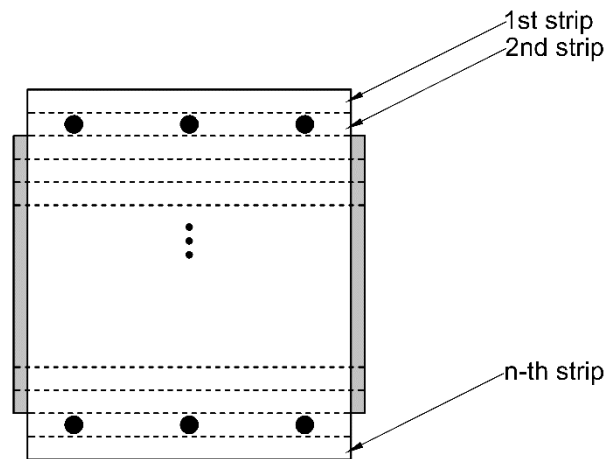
Layered cross-section of beam in Specimen G-M
